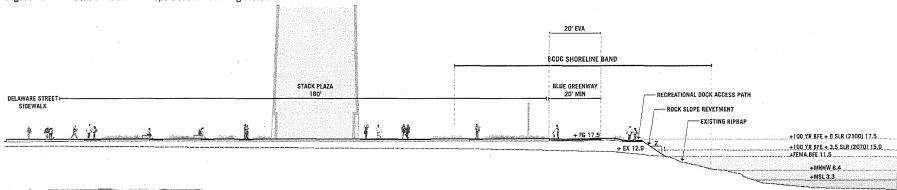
Stack Plaza: Concept Section Looking North
